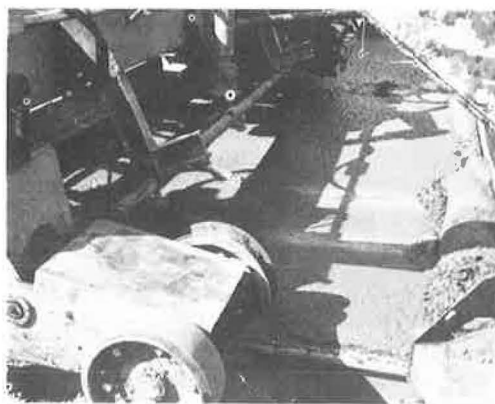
Internal vibrator mounted on paver and "wake" developed as vibrator passes through 1½-in. slump concrete.
